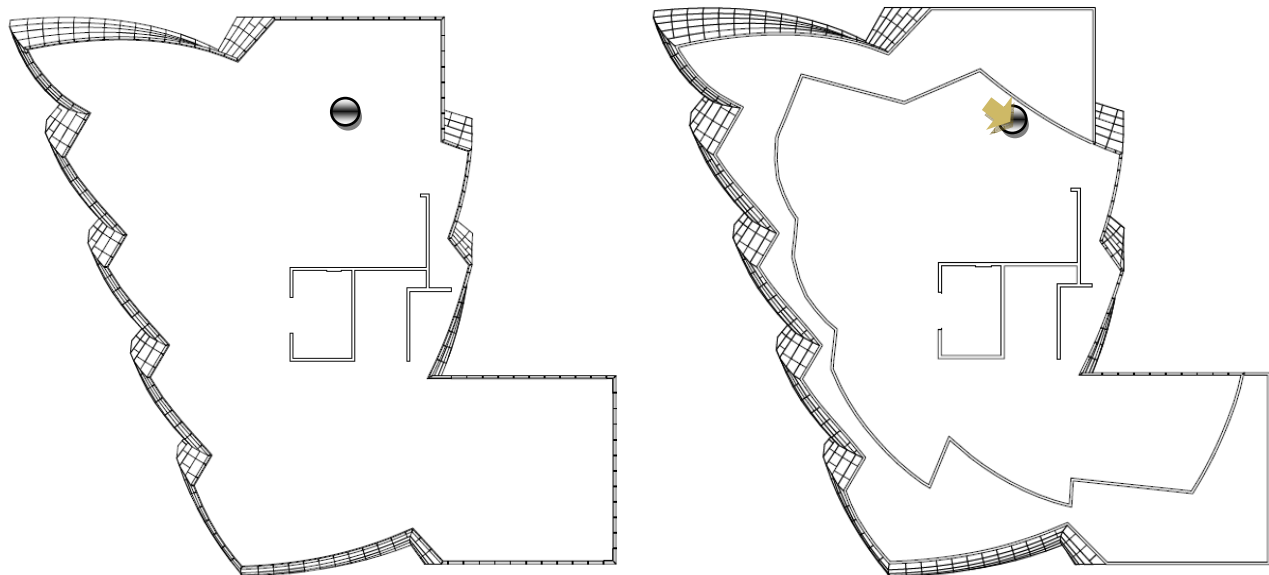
5th Level vs. 6th Level Plans: illustrating the shift in column locations between floors
